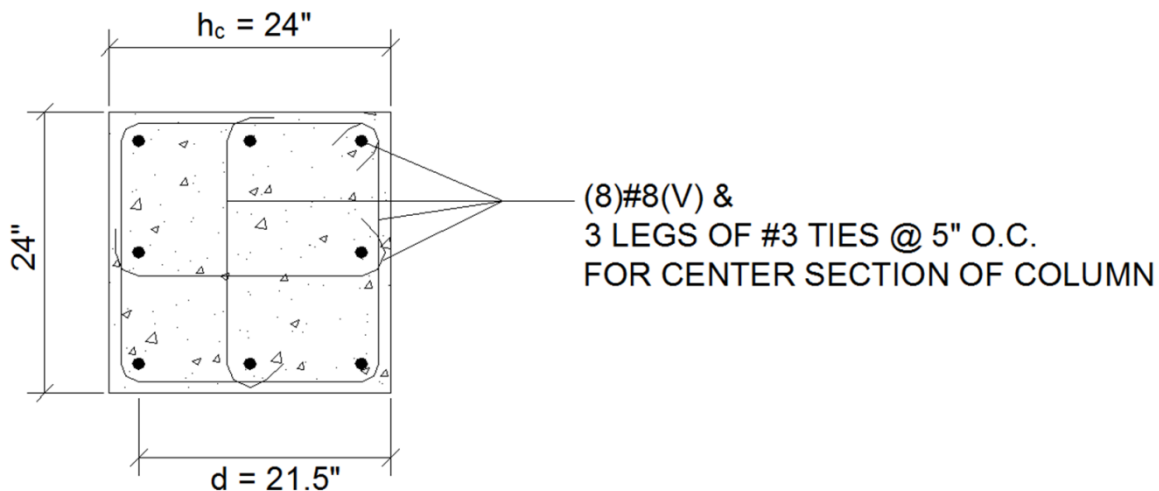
Interior column, center section cross-section for column at all floor levels based on SDC D design.
